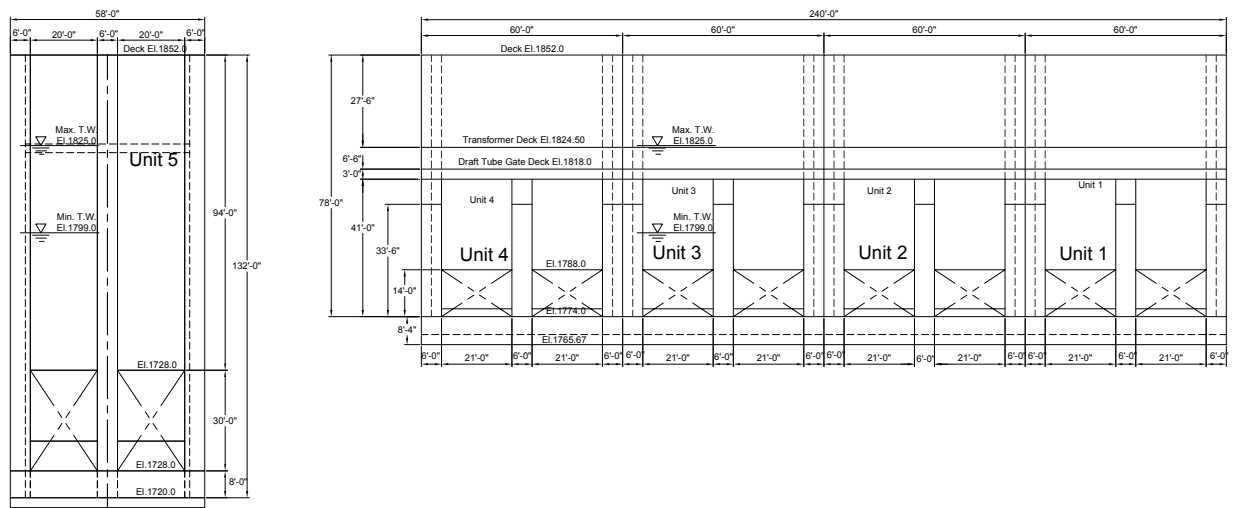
Downstream elevation view of powerhouse units 1-5
